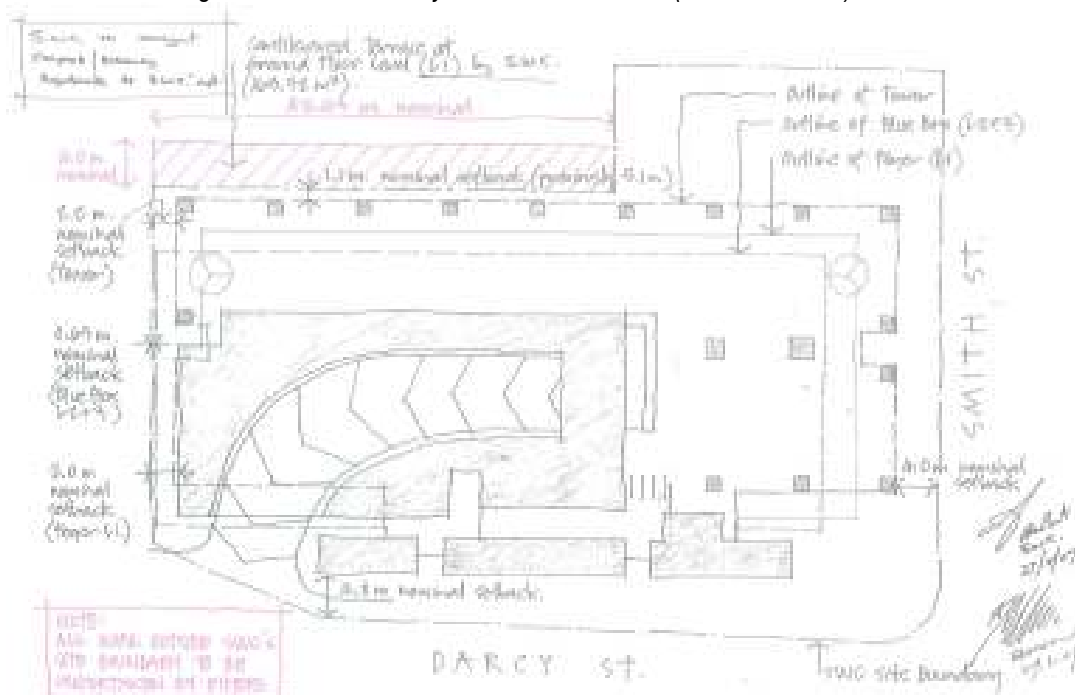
Sketch provided by Proponent in Preferred Project Report illustrating agreed upon relocation of the proposed building.
